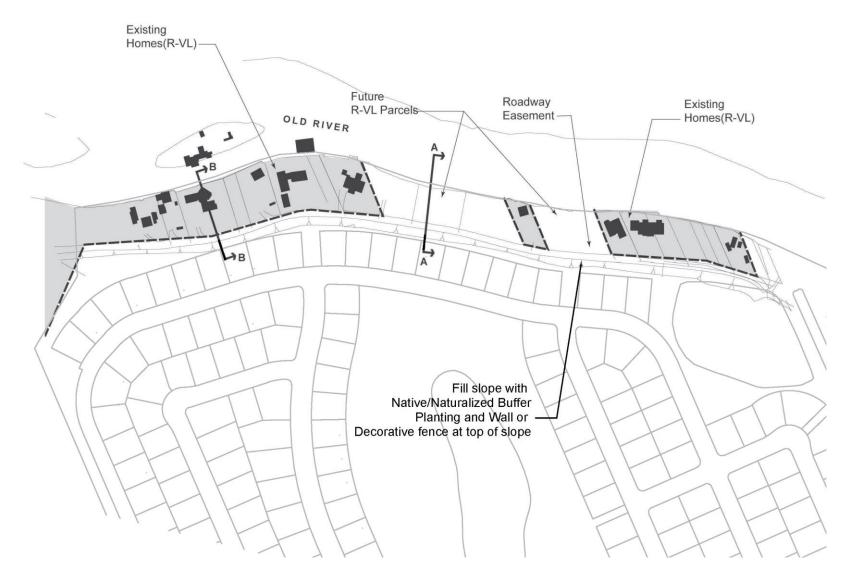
OLD RIVER HOMESITES PLAN
